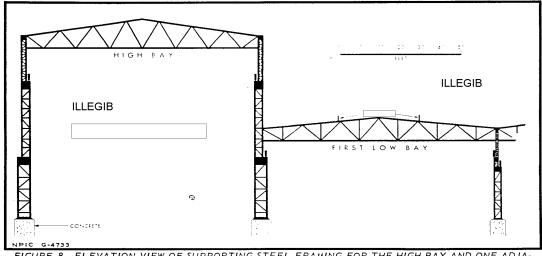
ELEVATION VIEW OF SUPPORTING STEEL FRAMING FOR THE HIGH BAY AND ONE ADJA-CENT LOW BAY AT VERKHNYAYA SALDA AND KUYBYSHEV METALLURGICAL PLANTS.
